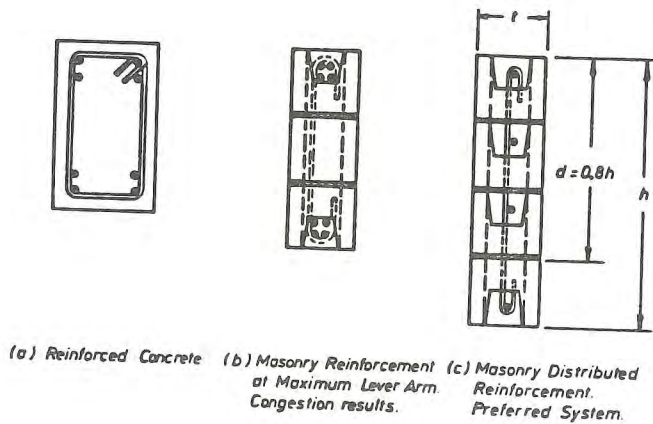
DISTRIBUTION OF BEAM FLEXURAL REINFORCEMENT
